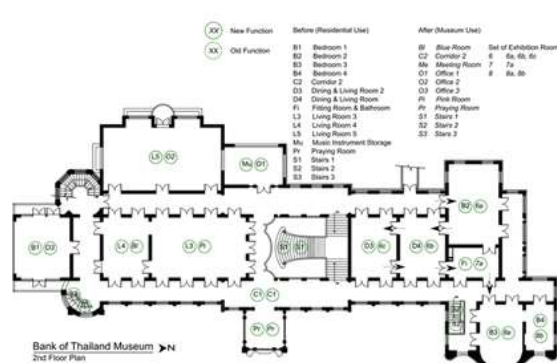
2nd Floor Plan of Bang Khunphrom Palace
